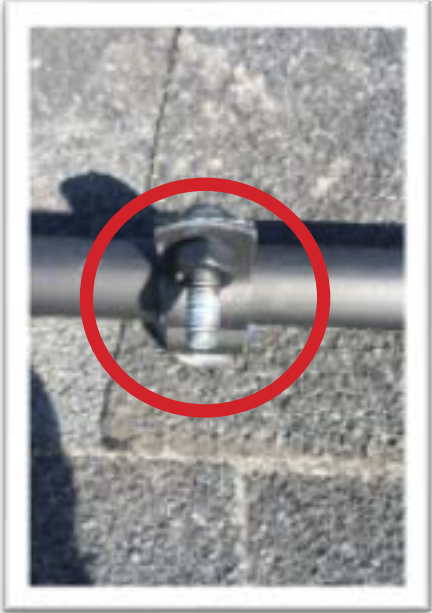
Where not protected from physical damage, equipment grounding conductor must be #6 or larger: NEC 690.46, 250.120(C). Conductors laying on asphalt shingles will become damaged and will not last a PV system's expected 30-year lifespan.
